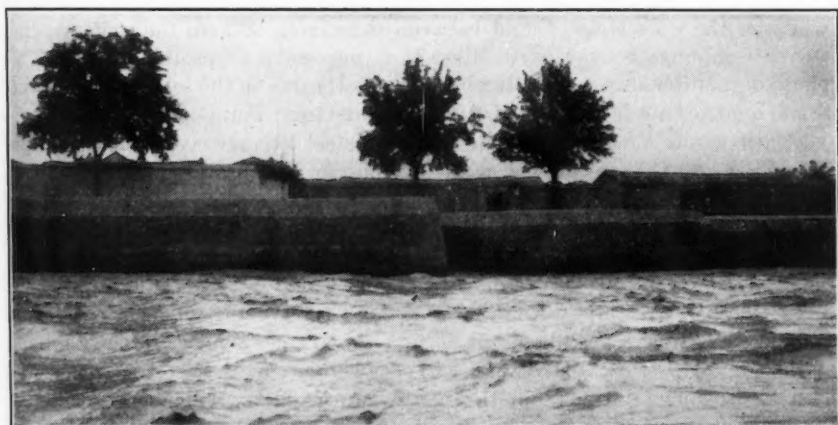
NEW KAOLIANG LAYER WITH EARTH COVER ON TOP OF OLD FISH-SCALE BANK PROTECTION
